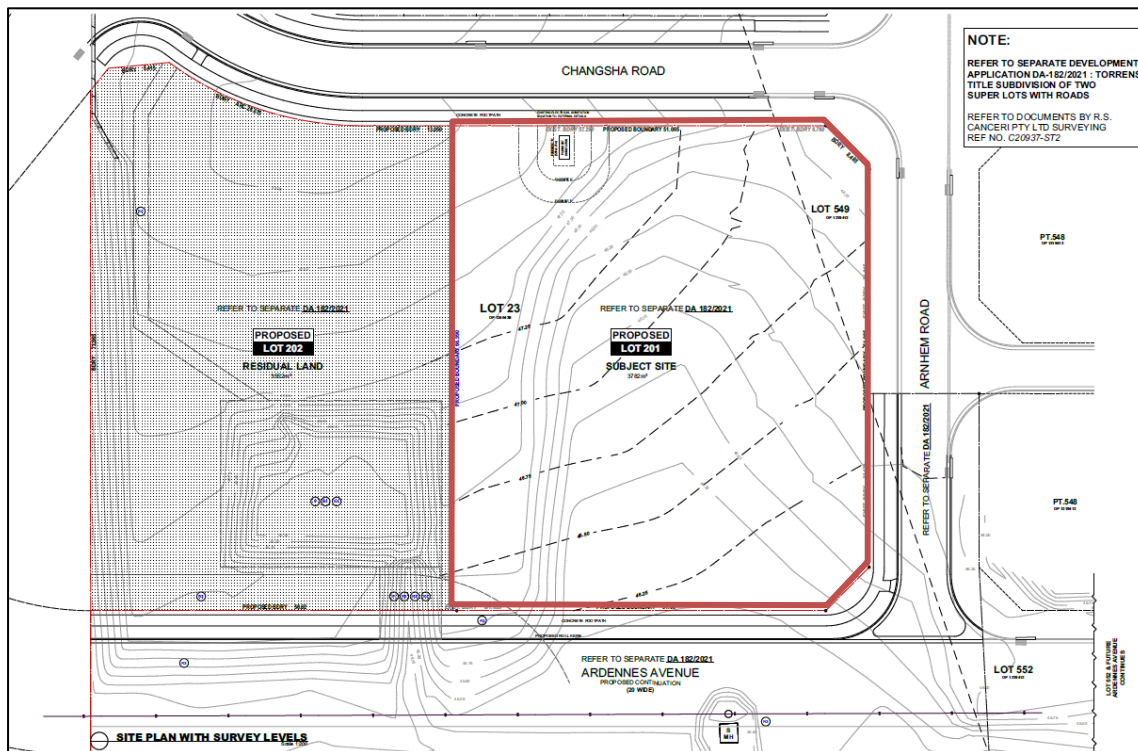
Subdivision Plan under DA-182/2021 (future subject site in orange outline)
